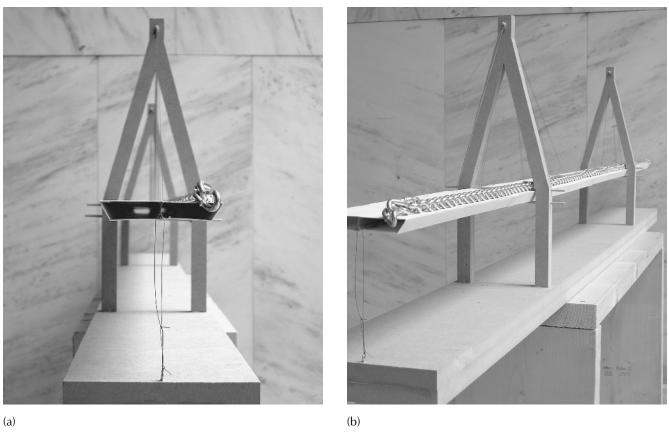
(a, b) Two views of a model bridge with stays down the centerline.
